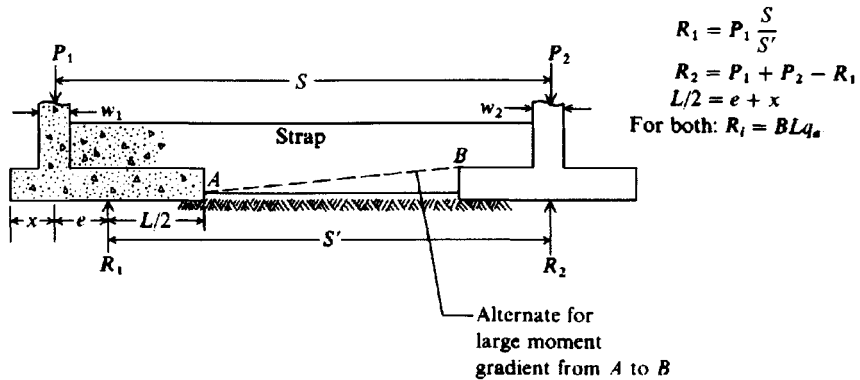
Assumed loading and reactions for a strap footing design. Make strap width about the same as the smallest column w .
